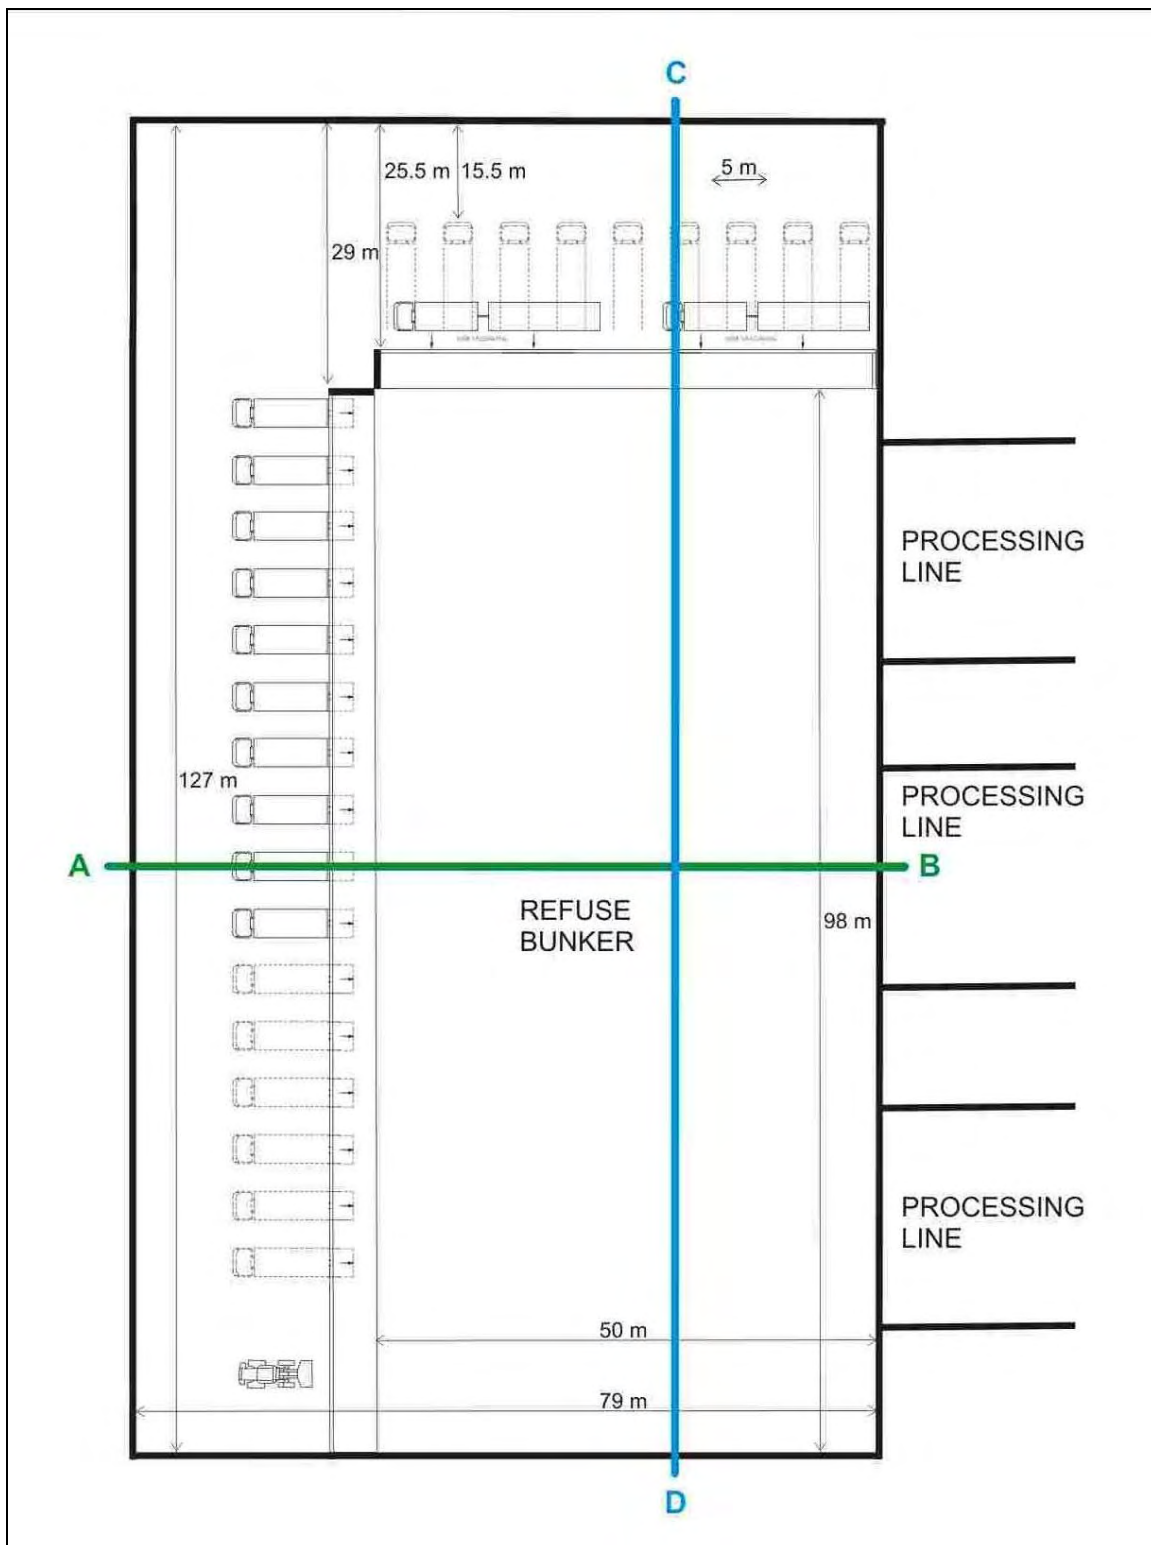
Plan of the tipping floor of the proposed plant (based on Reference 23).
